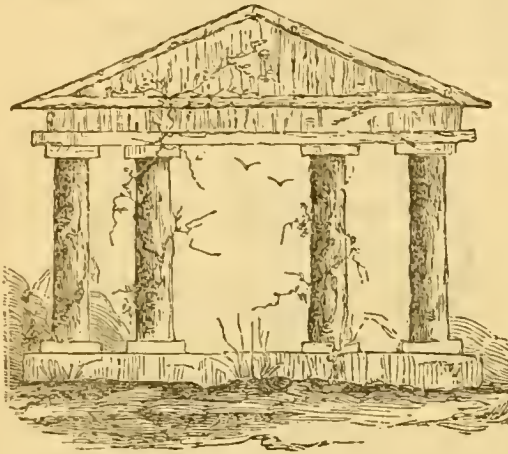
is a design for a summer-house in the Grecian style. The roof is formed of rough boards, and the gables or pediment and cornice are covered with bark. The roof is supported by pillars formed of the trunks of trees with the bark on. A house built in this way, embowered in shade and overgrown with ivy or creepers, produces a charming effect.
